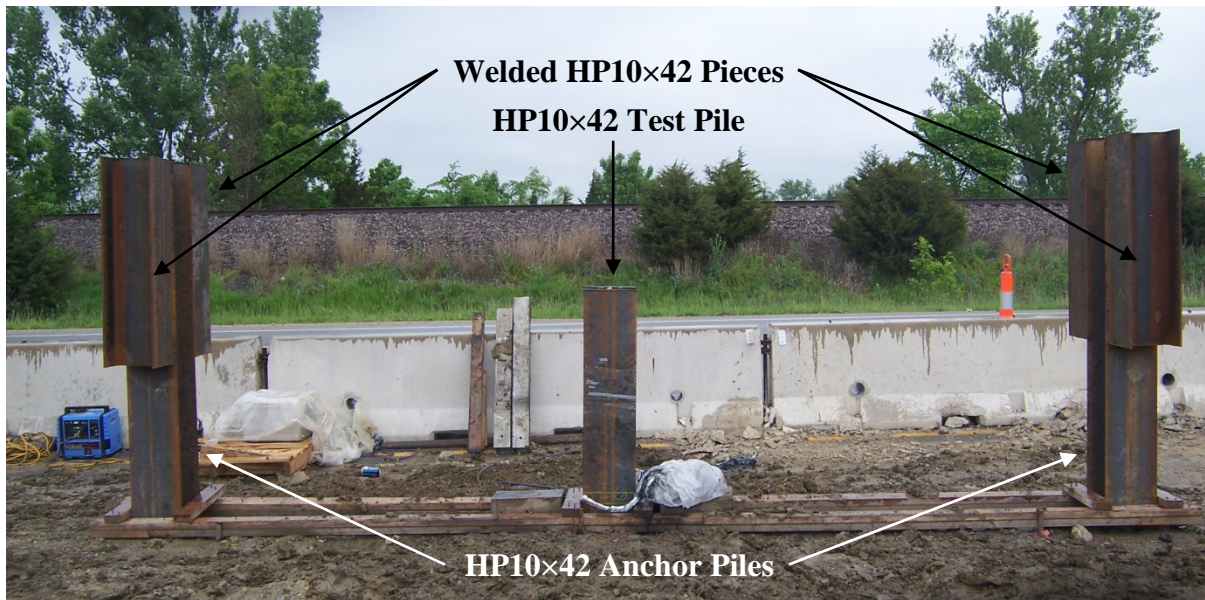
ISU5 Piles at Completion of the Driving and Restrikes, with the Welded HP 10x42 Pieces Secured to the Anchor Piles
